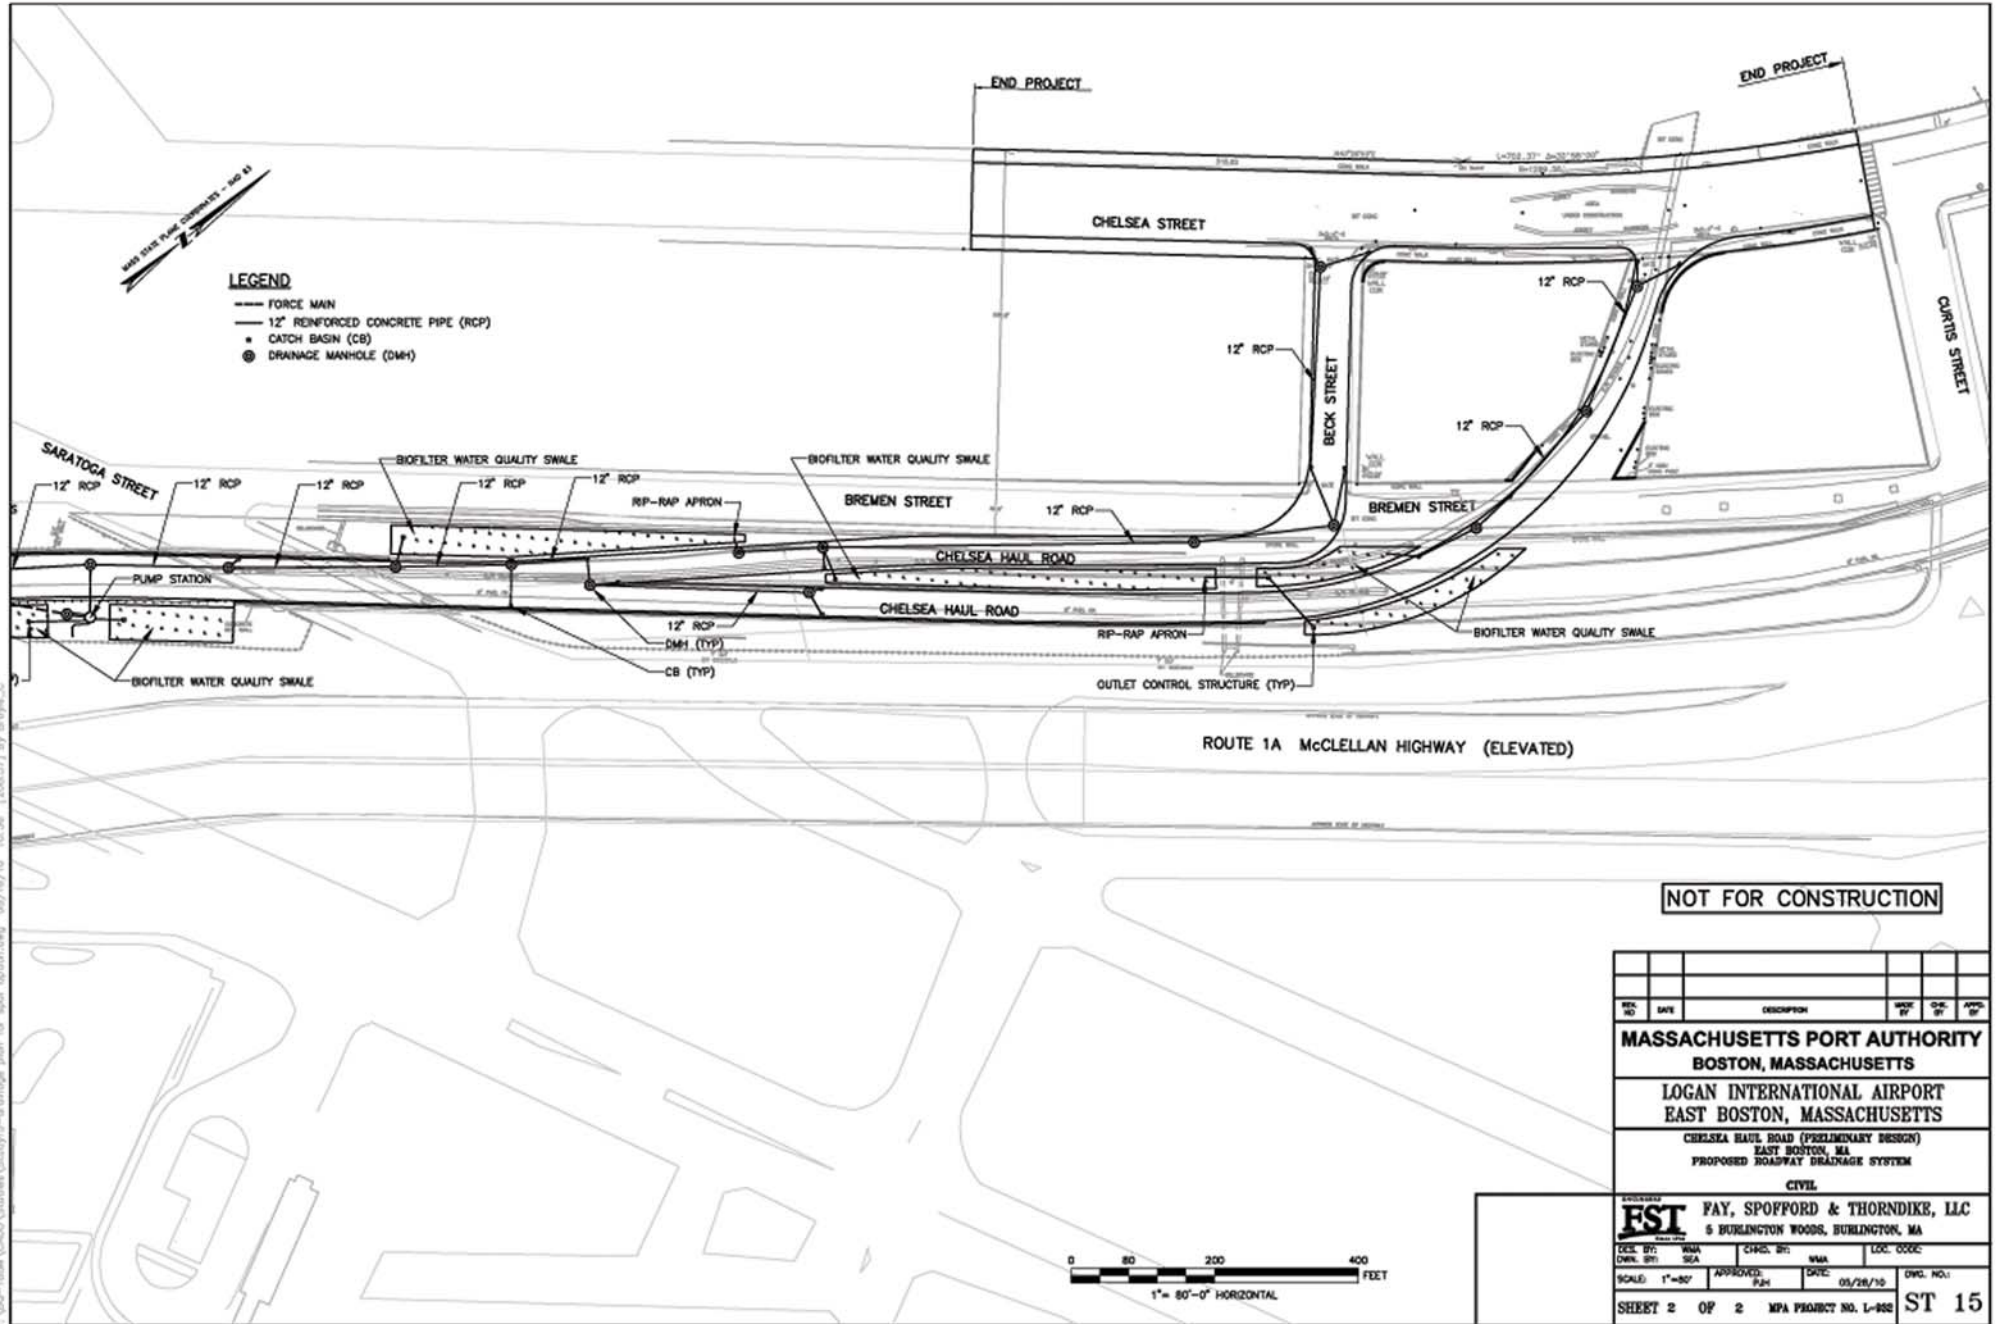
B - DRAINAGE PLAN FOR SPUR ALIGNMENT 2
